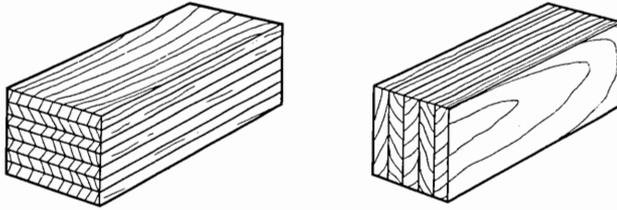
Two Arrangements of Laminations in Laminated Timber.
